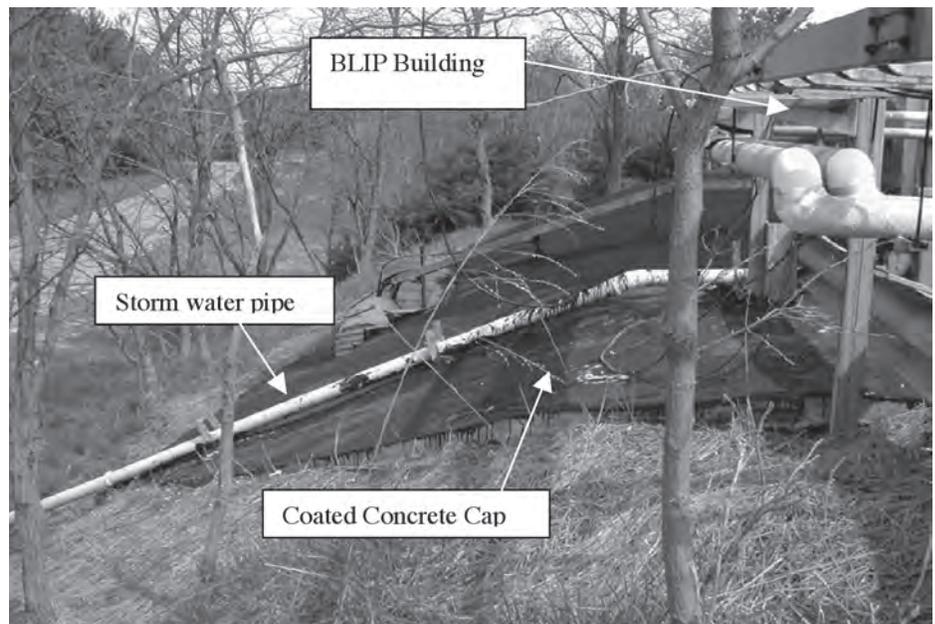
Concrete cap on the west side of the BLIP facility. White pipe conveys stormwater collected from roof drains away from the building.
